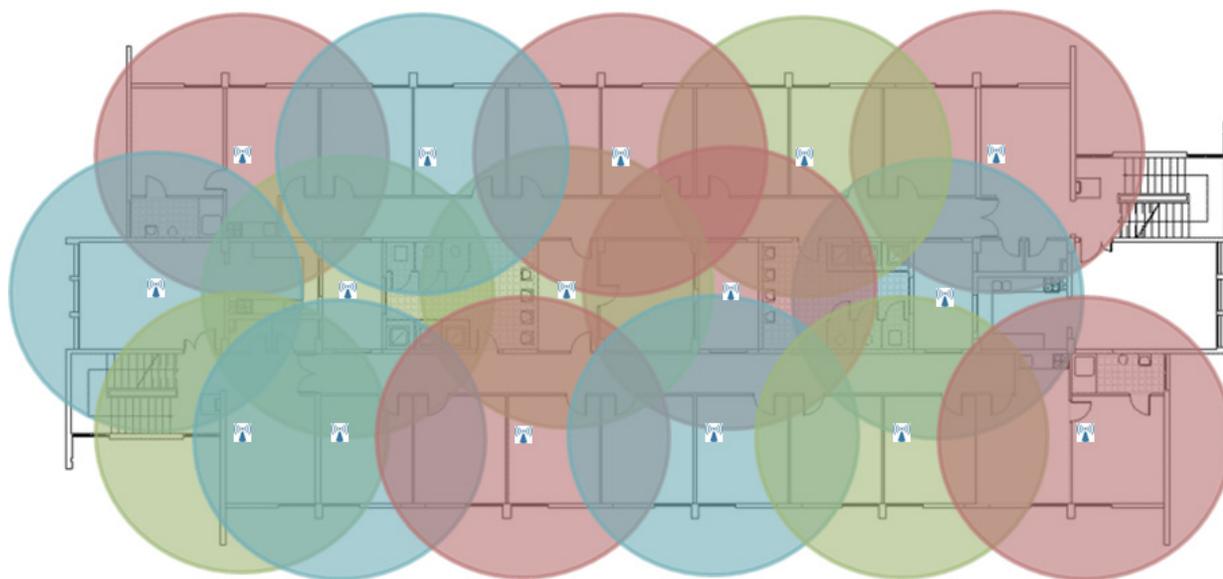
Dormitory AP Placement Plan and 2.4 GHz Channel Plan
